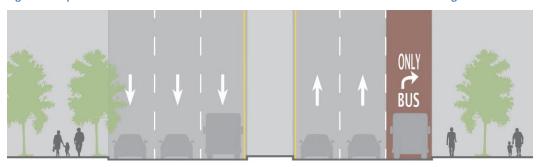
| Alternative 4 cross-section of Chain Bridge Road from International Drive to Tysons One Place
